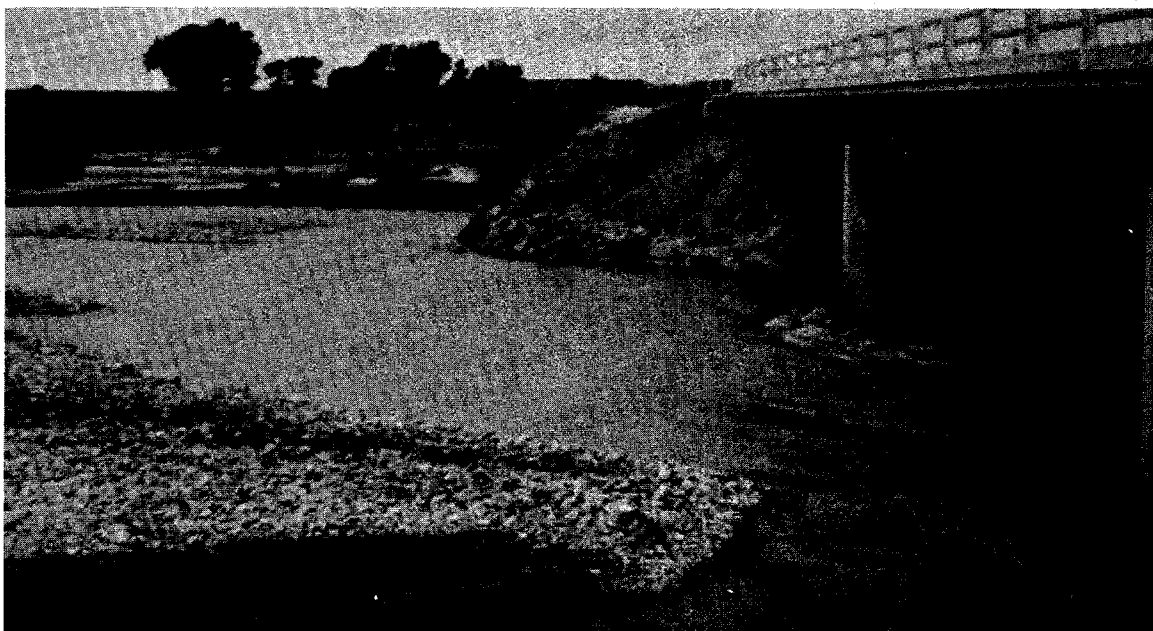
View toward right abutment of SR-223 bridge, showing (at left) alignment of flow entering bridge waterway. (Montana Dept. of Highways photograph, taken about 1975.)
